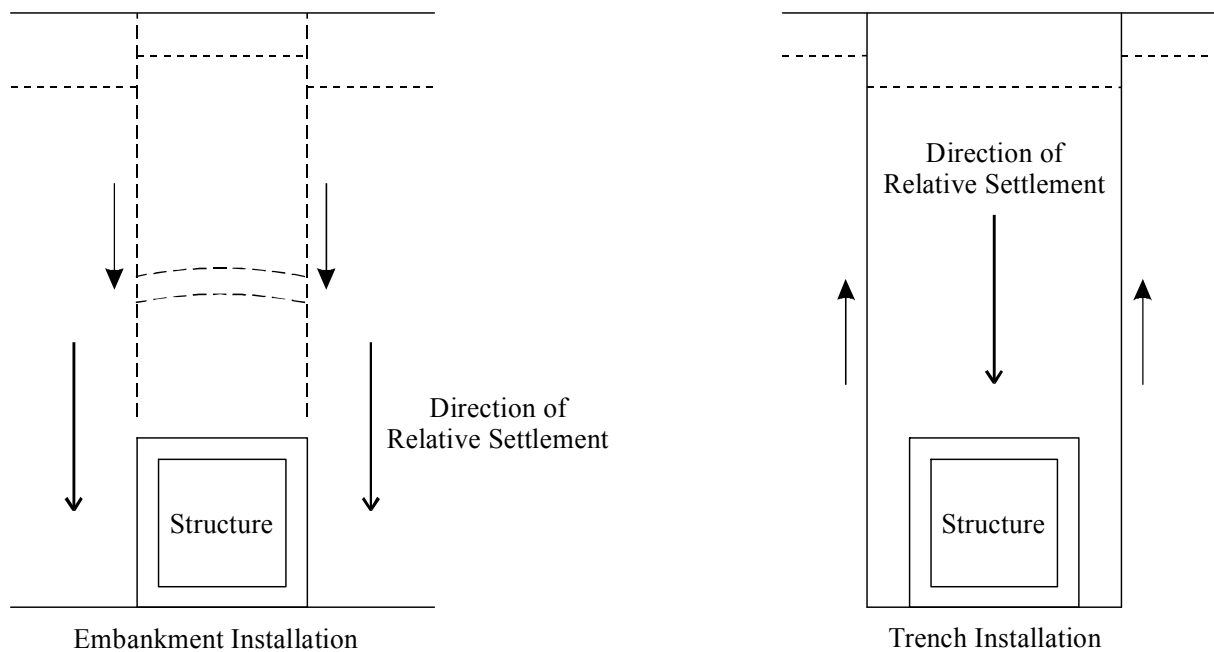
Arching Action within Fill Material for Buried Conduit Installations
